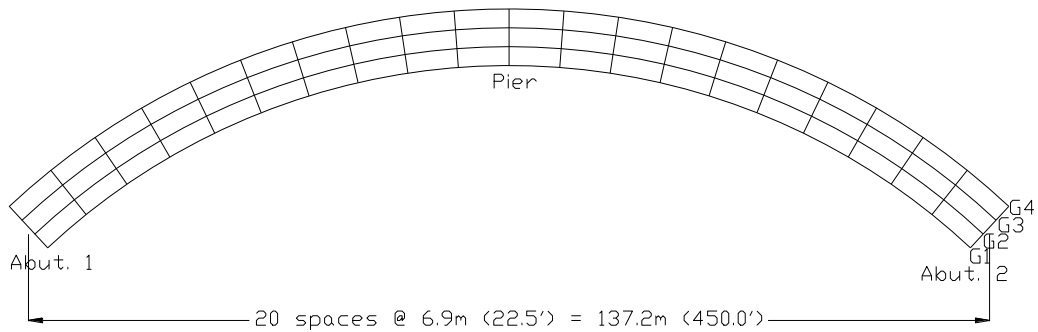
Simplified Framing Plan, Balanced Two-Span, 4-Girder, 91-m (300-ft) Radius Bridge, R/L = 13.33.
